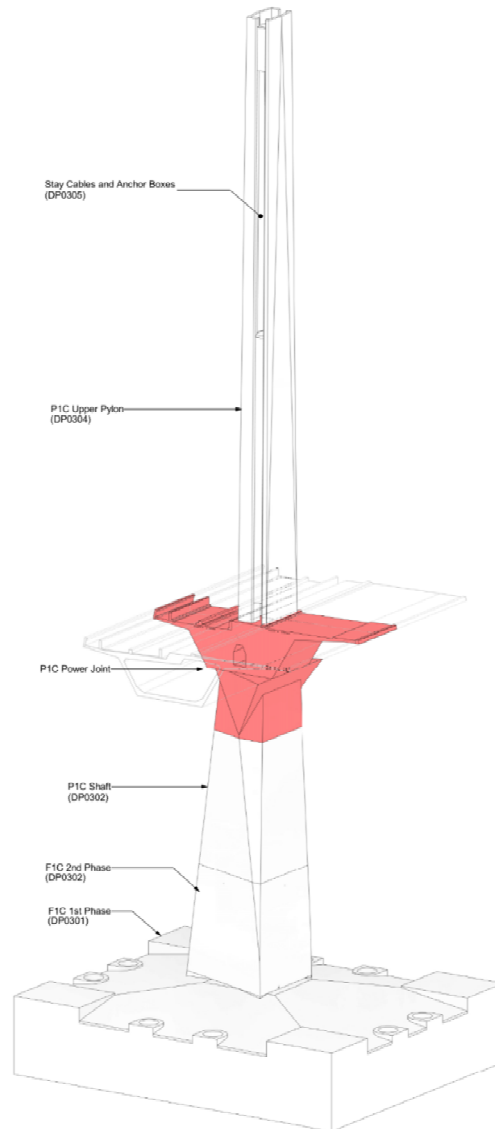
Precast 1C Foundation and Cast-in-place Pylon
